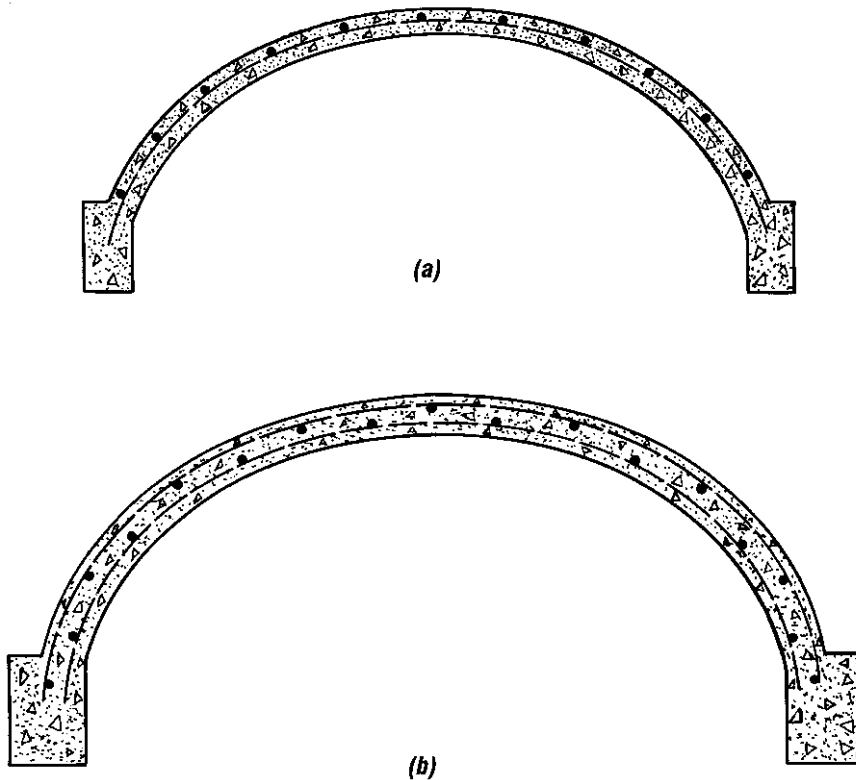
Arch reinforcement: (a) single layer; (b) double layer.
